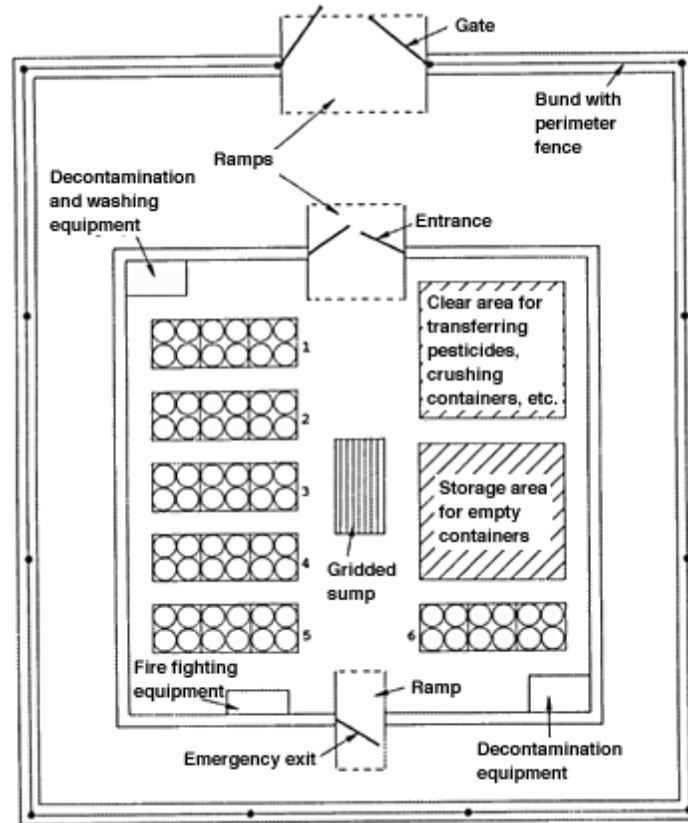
Store layout to show arrangement of facilities (not to scale)
